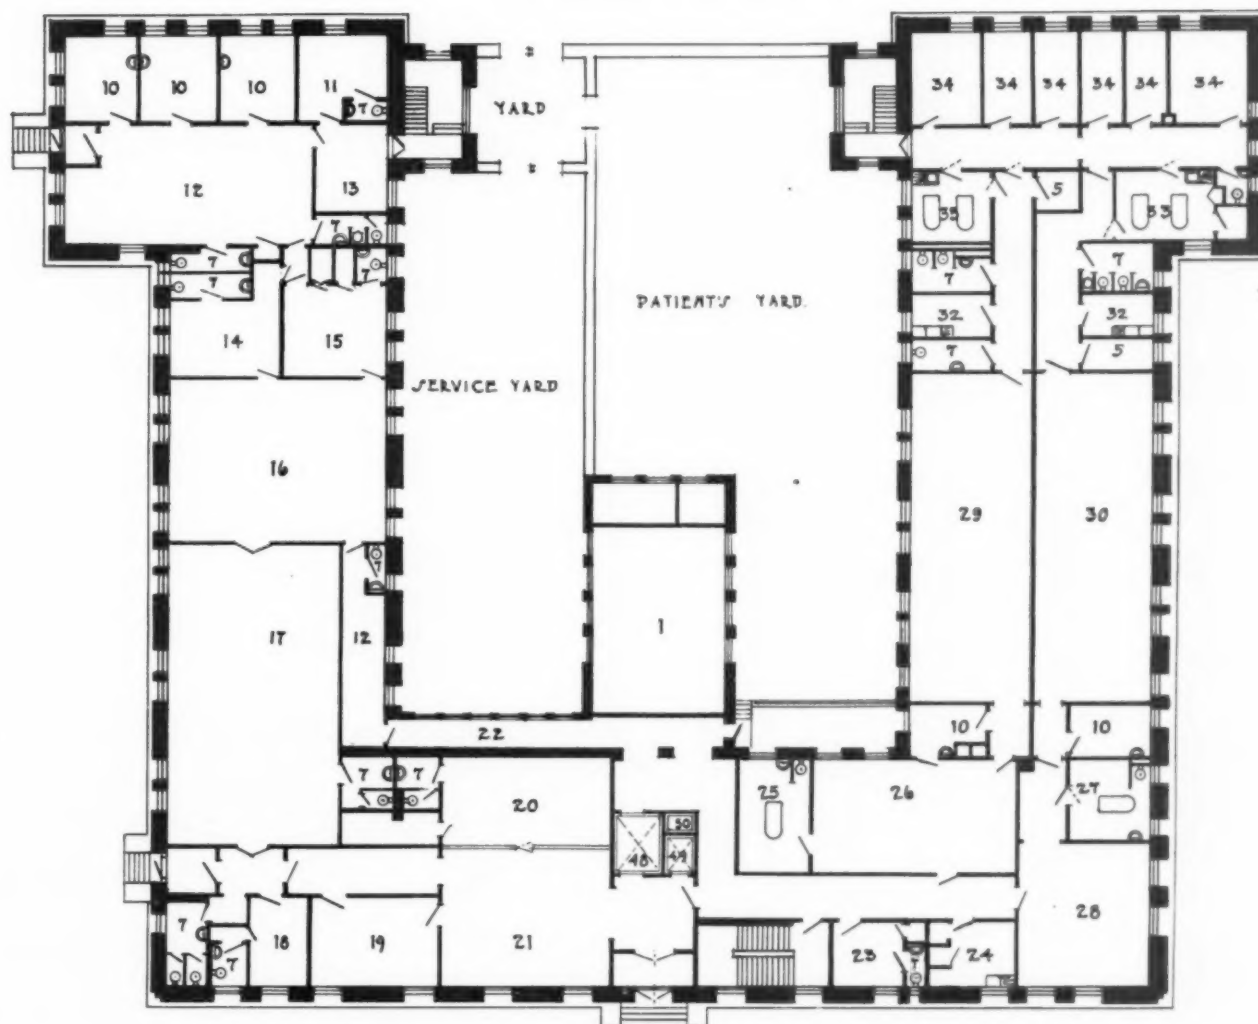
Cook County Psychopathic Hospital—First floor plan.
